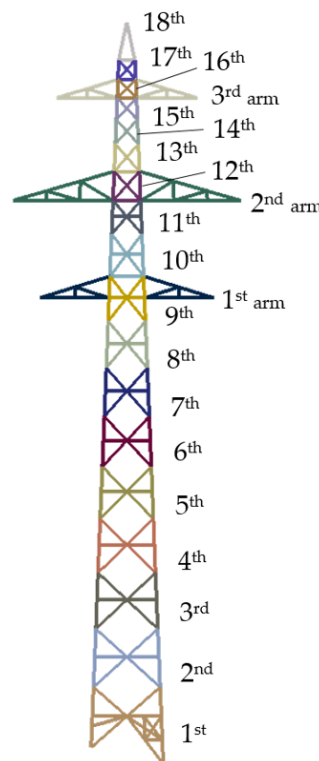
Structure subdivision into sections or levels for the wind load application.
